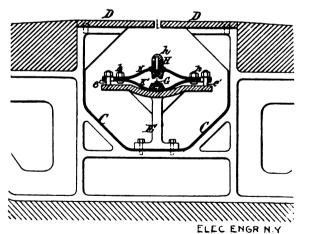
The Grant Railway Conduit System.—Transverse SECTION.
